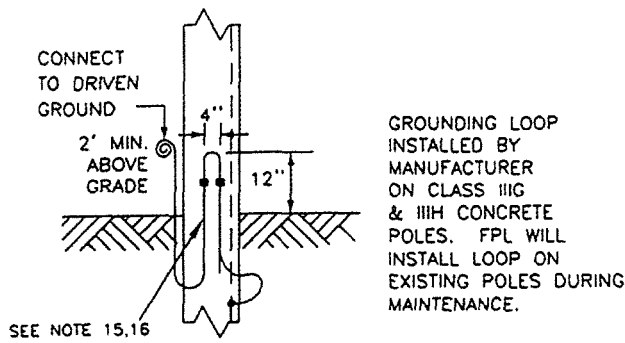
CONCRETE POLE GROUNDING DETAIL
